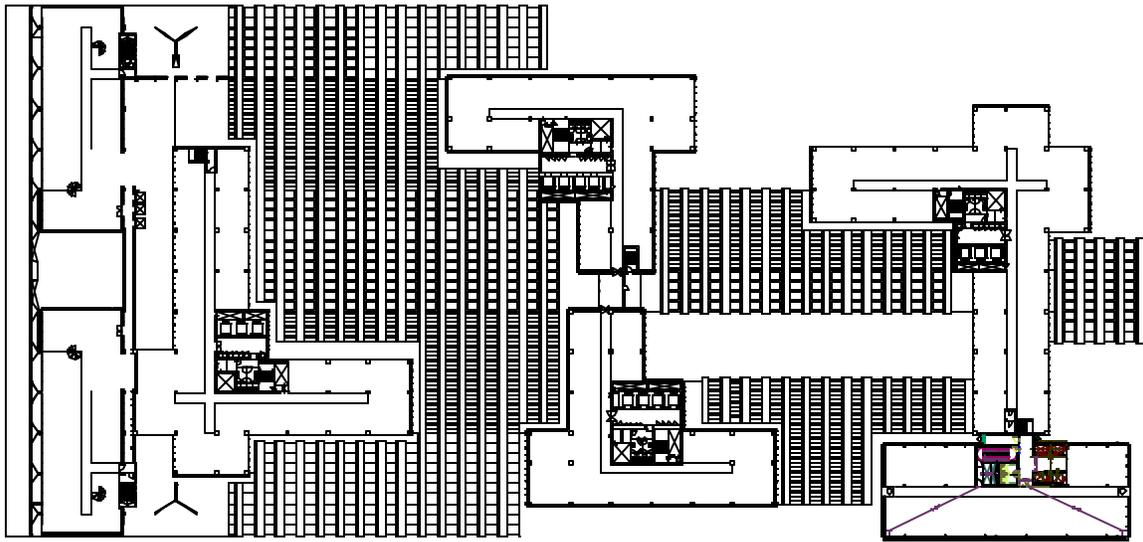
Sixth Floor Plan of WTC, not to scale (courtesy of KPFI)
